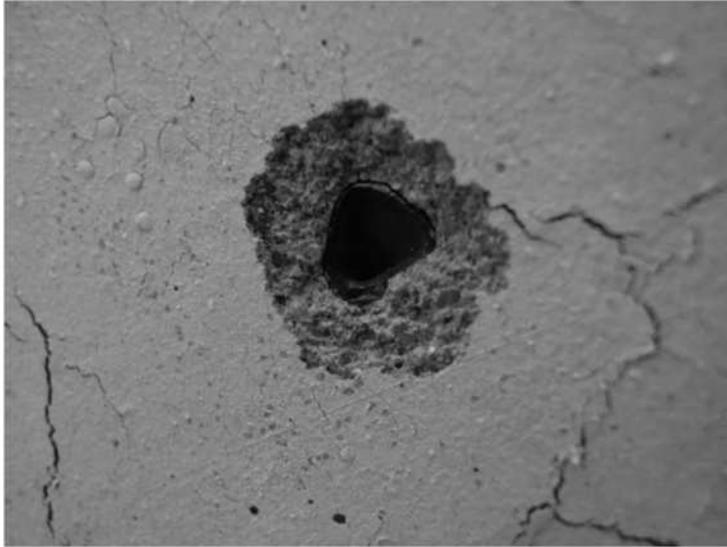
, Explosive spalling on face of concrete cube.
